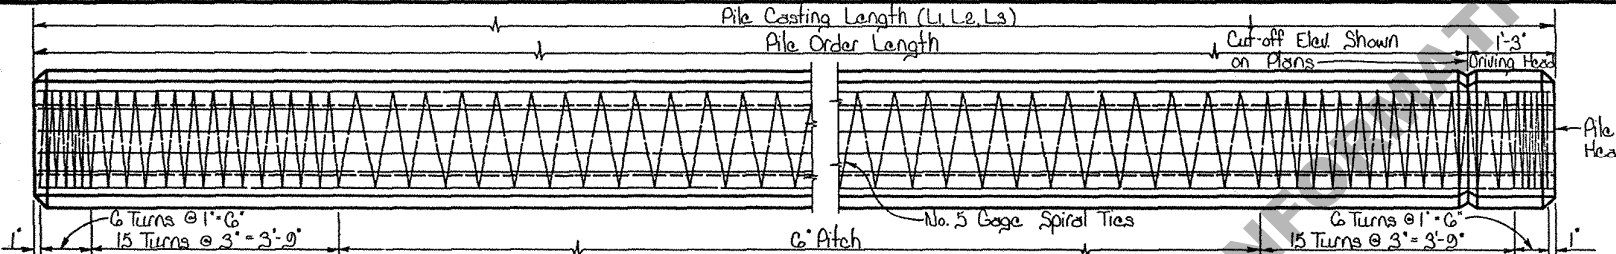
, 30 & 36 INCH SQ. PRECAST REINFORCED CONCRETE PILES
